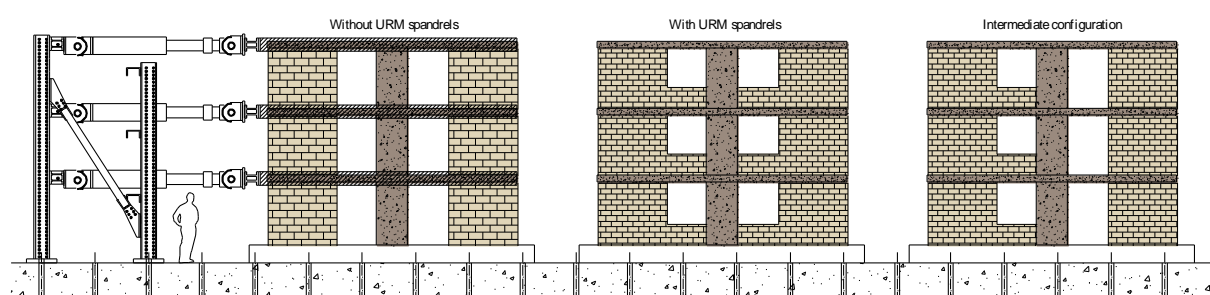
Envisaged test set-up and test units for quasi-static cyclic tests on 3-storey mixed RC-URM wall buildings.
